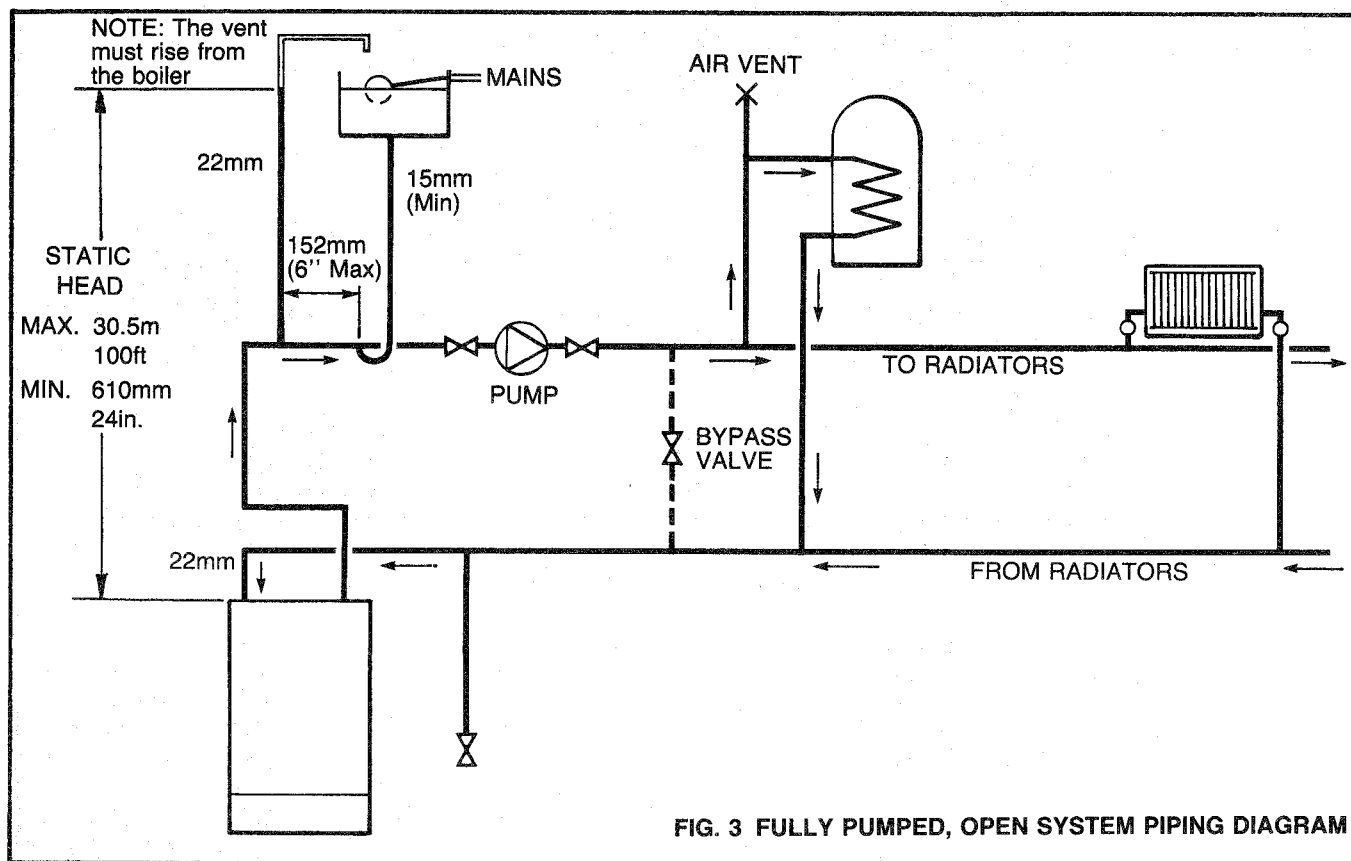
FULLY PUMPED, OPEN SYSTEM PIPING DIAGRAM
